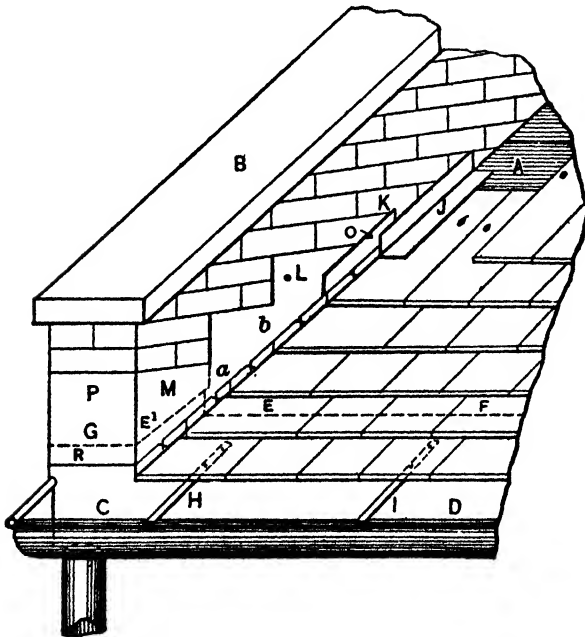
Putting in Step and Counter or Cap Flashing for Shingle or Slate Roof
